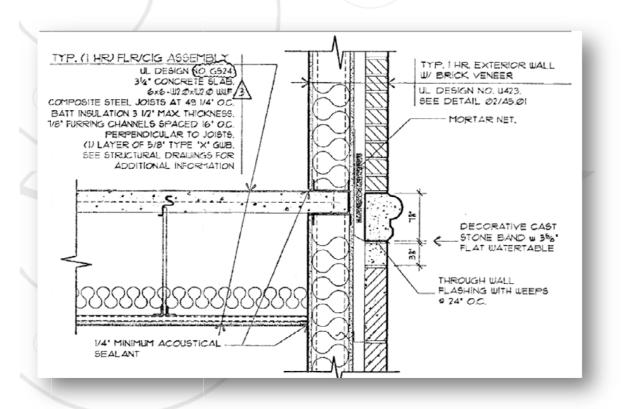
Wellington Condominiums Project Floor-Ceiling Assembly Detail
